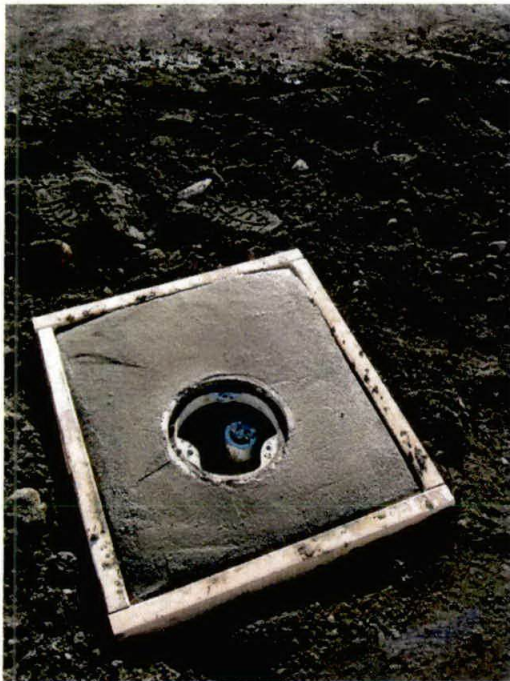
Typical installation of monument around slotted pipe installed in test pit.
